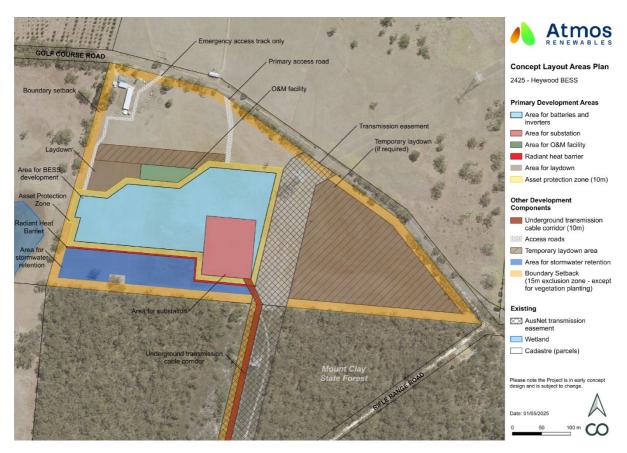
Proposed concept layout of the Project (Source: Atmos Renewables, April 2025).
